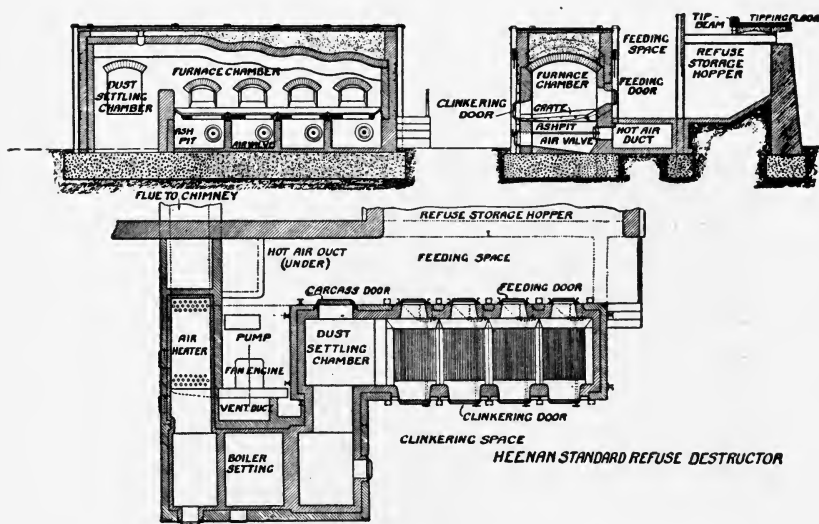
PLAN AND SECTIONS OF DESTROYER, NEW BRIGHTON, N. Y.
